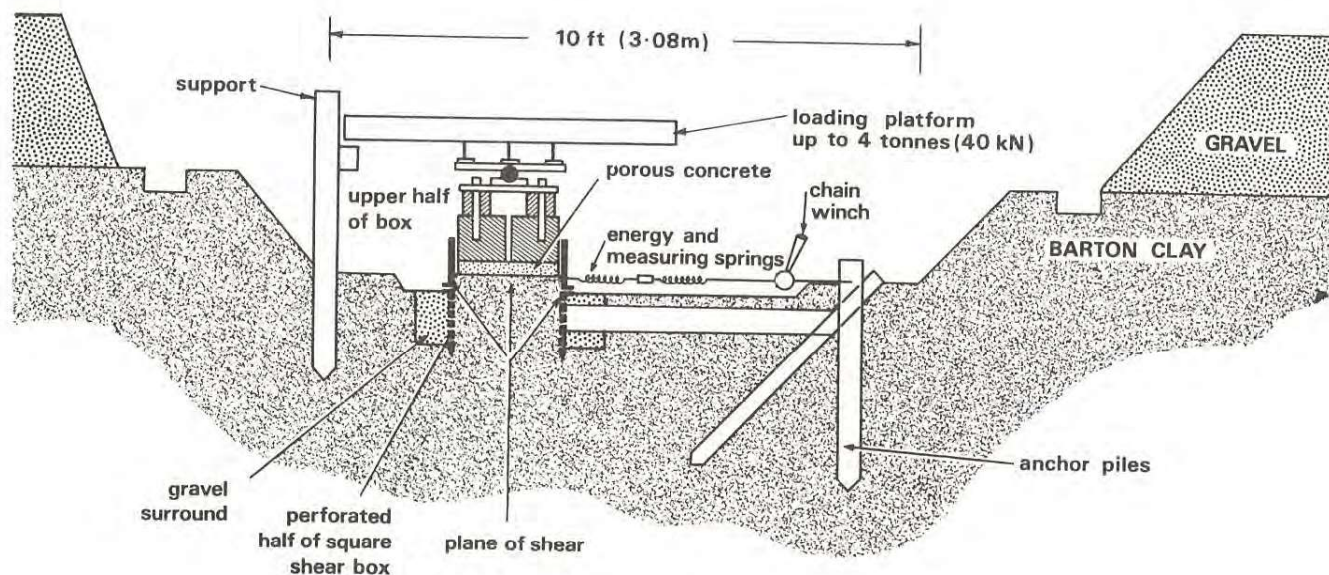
Diagrammatic section of in-situ shear box and loading arrangements
